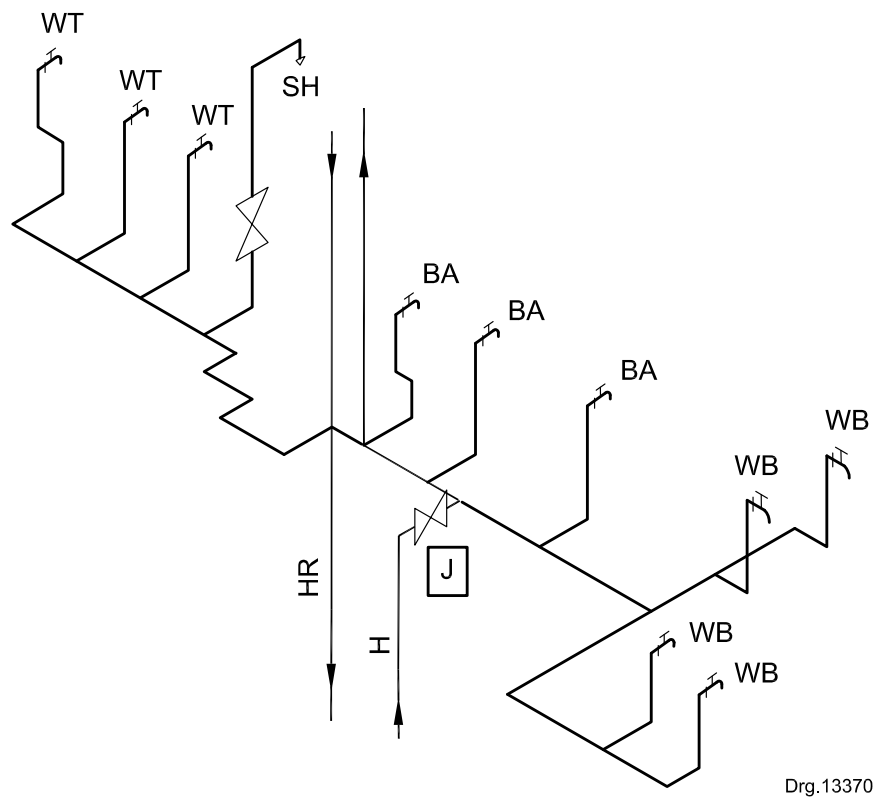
Schematic arrangement of hot water installation on second floor ablution facility
